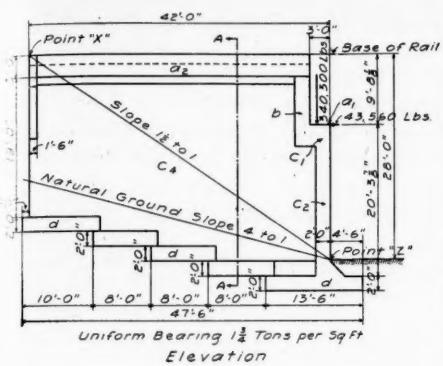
Type C₆; Reinforced Concrete T Abutment.
